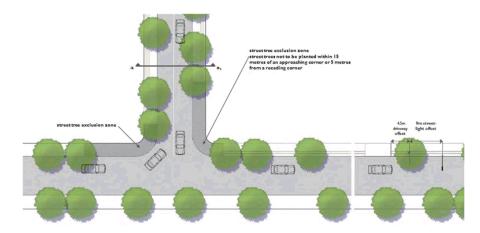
Street tree set out. Footpath tree planting for private works should be planted at 10 to 20 m centres. Variations to this may be made to accommodate driveways, avoid power poles etc. To ensure effective street lighting, plant trees not closer than 9 m to a street light. The trees should be set back from the rear of the kerb at a distance of 1 m. Where this distance is not achievable due to constraints such as underground services a minimum set back of 0.6 m may be used in conjunction with the installation of root barrier. At intersections, all trees should be planted at a minimum 15 m back from the face of the kerb of the adjoining street. Minimum distances are to be agreed by Council, based on road layout and design speed.
